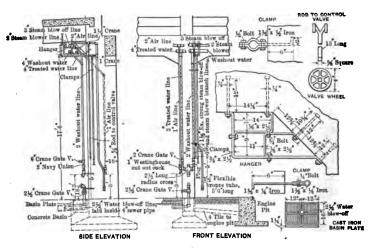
Details, 35-stall Engine House, A. T. & S. F. Ry.
